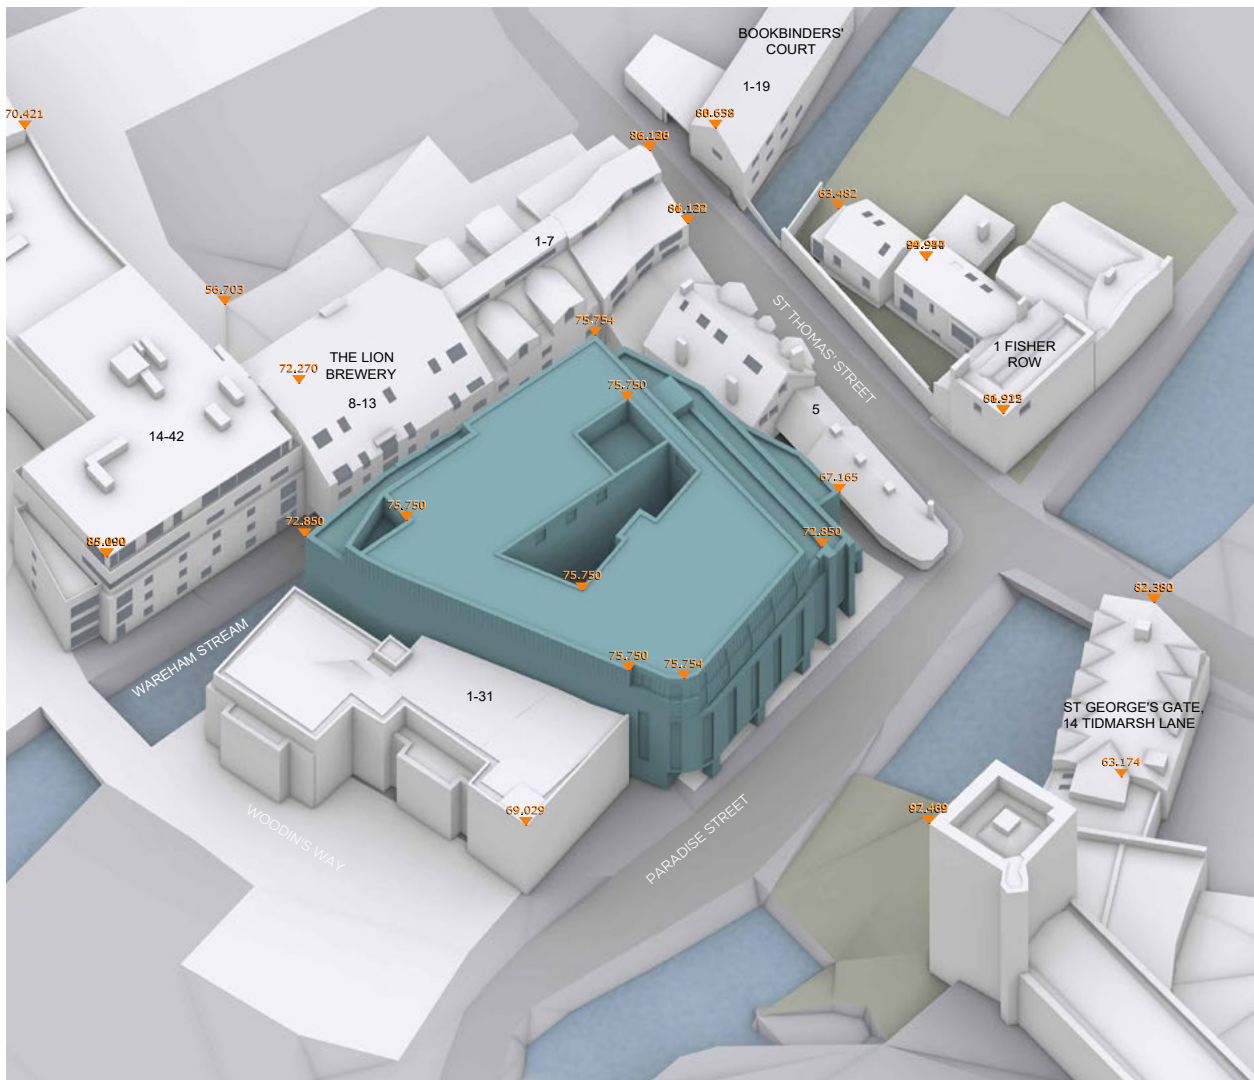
Existing Courtyard by Marriott Hotel with new rooftop extensions shown in teal
